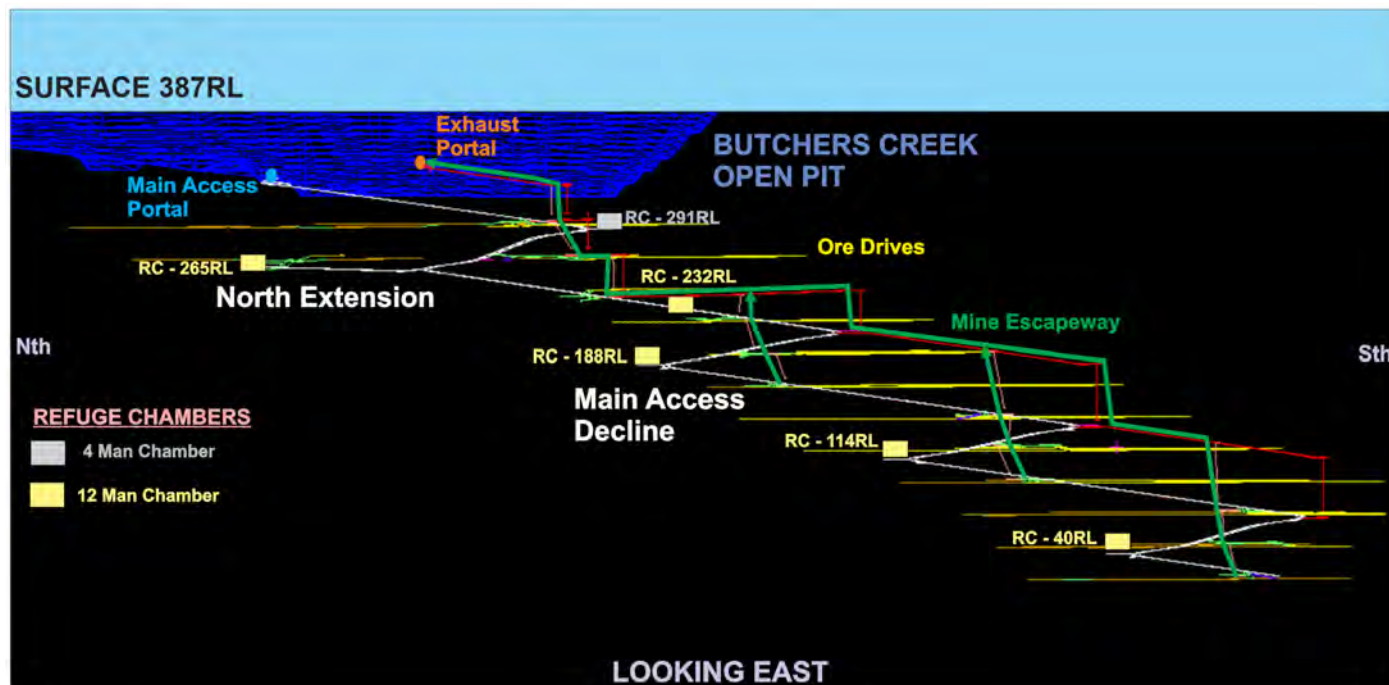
Underground Escapeway System & Refuge Chambers
